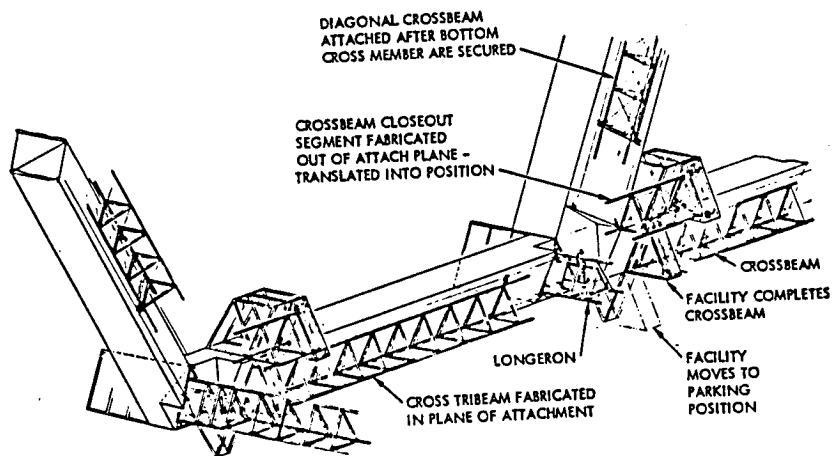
Typical 3-Way Intersection with Longeron
